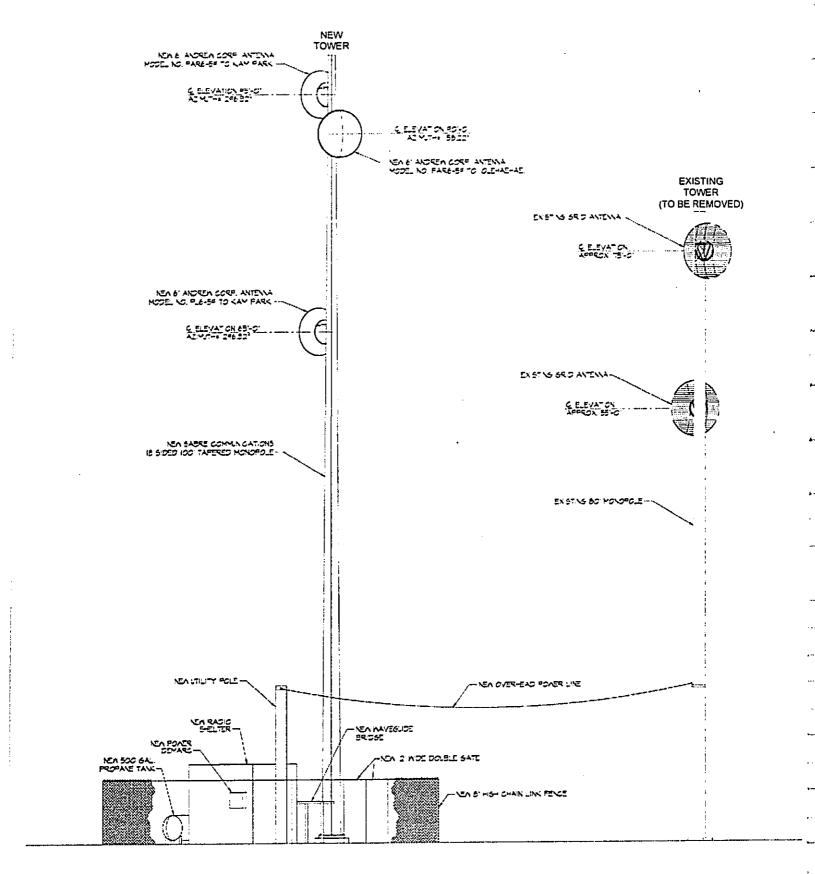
E Hamakua Police Station / Elevation Plan (looking north)
